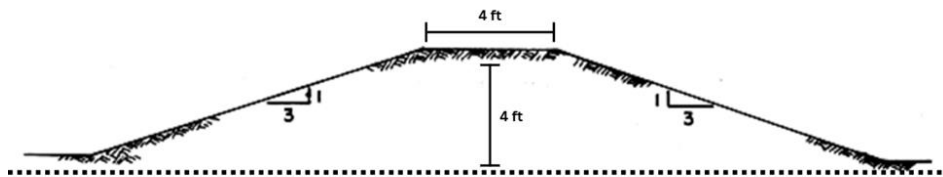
Design for the four feet tall dike. Note: the design is not to scale, (National Engineering Handbook, n.d.).
